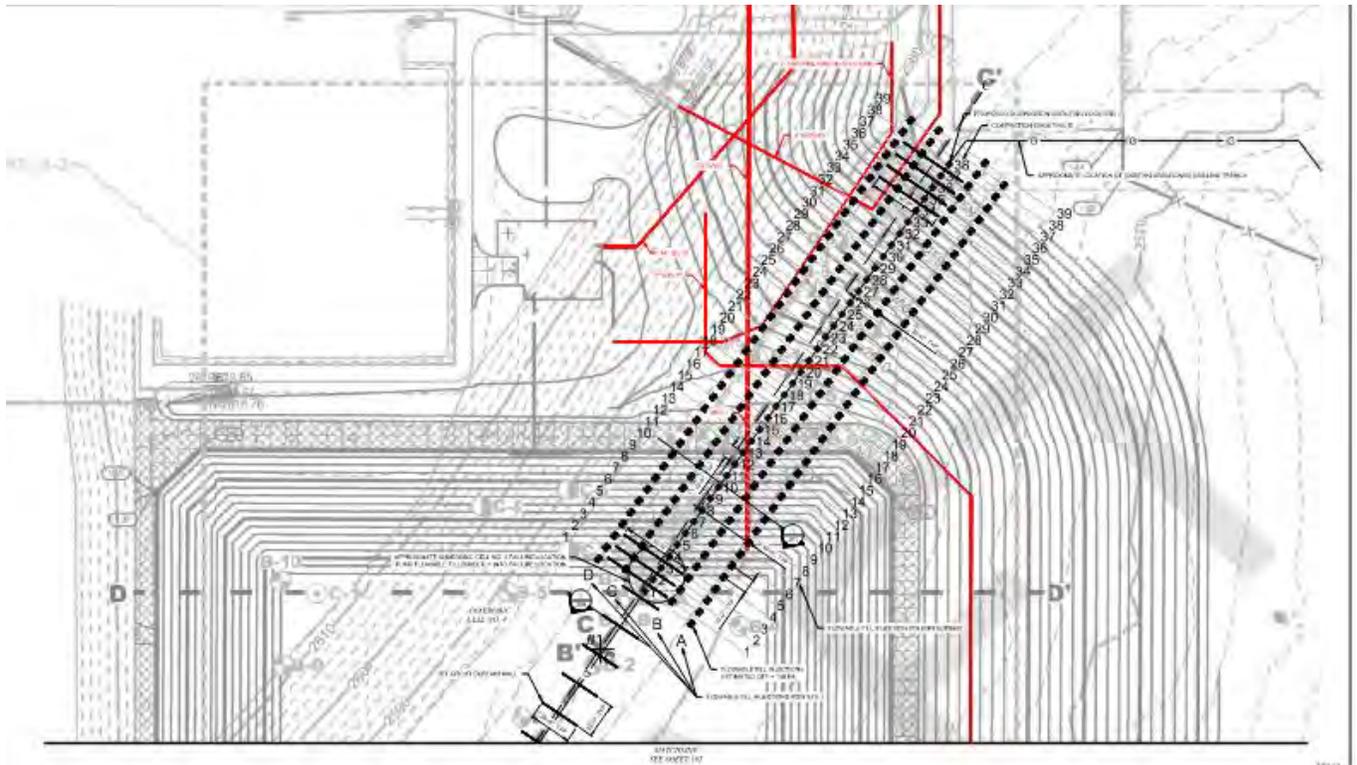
Area 1 Ground Improvement Plan – Void Filling, Compaction Grouting, and Jet Grout Curtains
